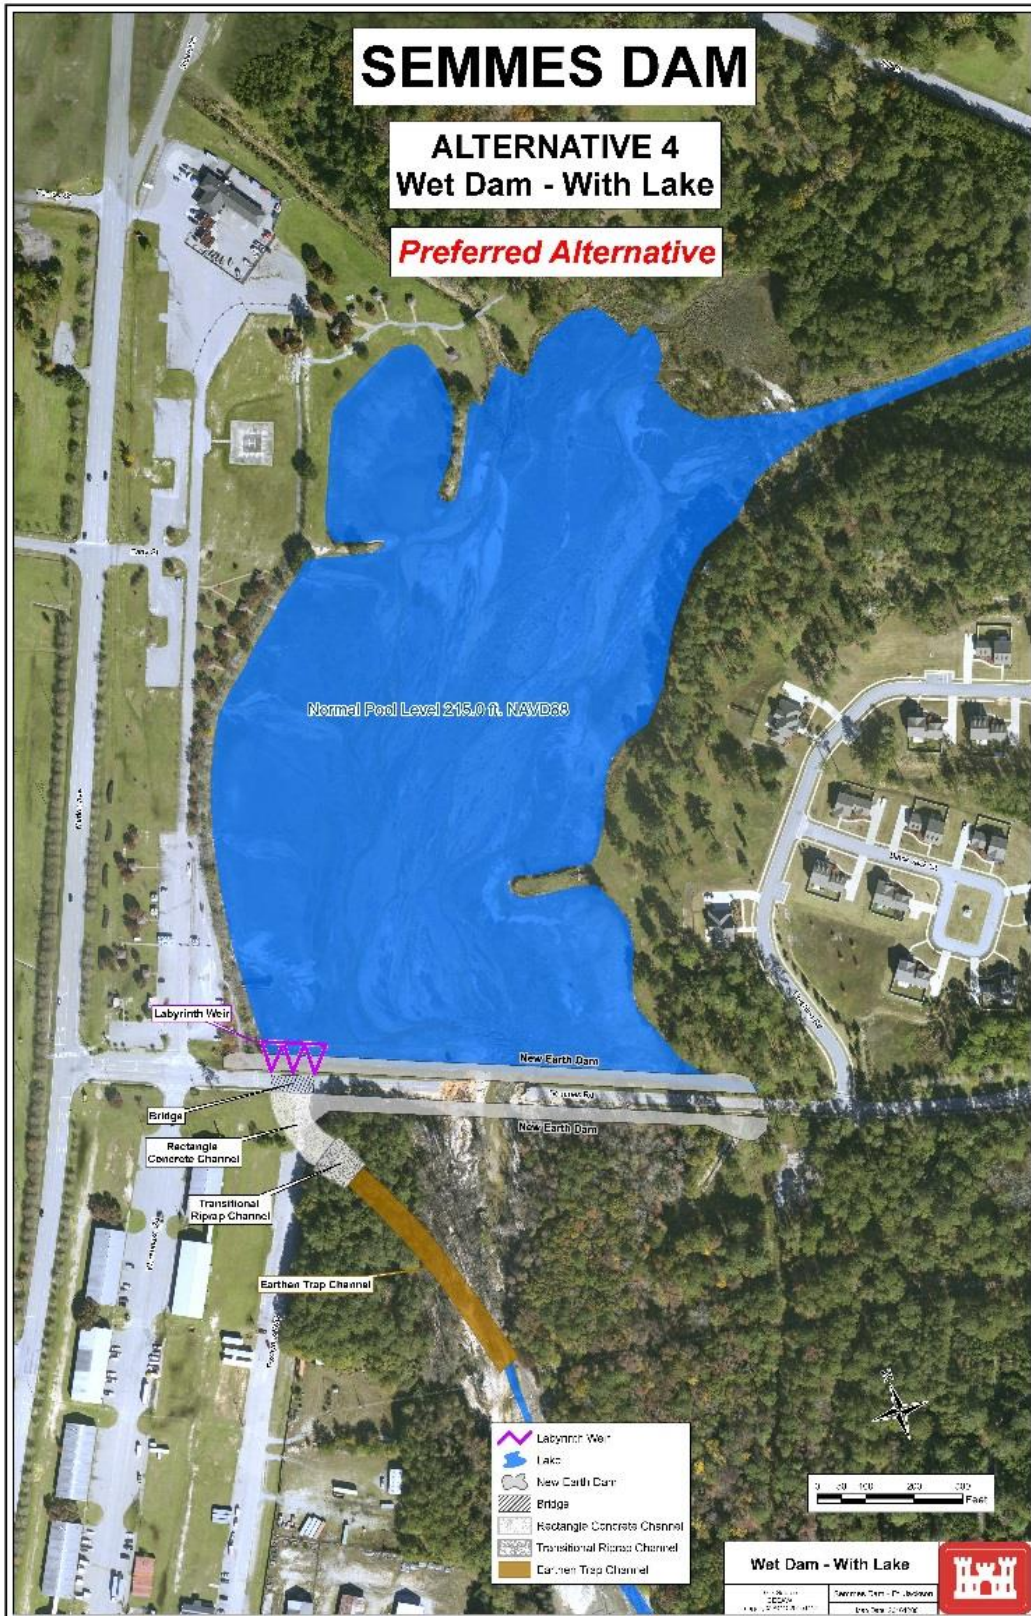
Alternative 4 – Rebuild the Dam and Road; Wet Dam (Lake) (Conceptual Design)
